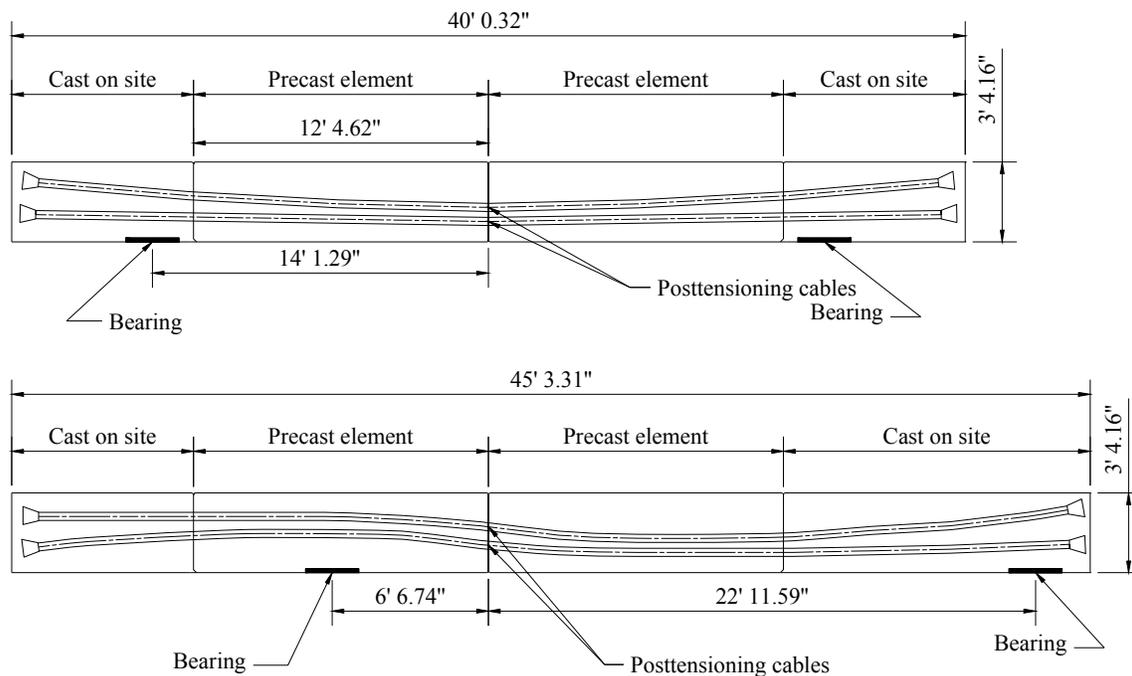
Post-tensioning cables of the crossbeams at piers A (upper) and B (lower)
